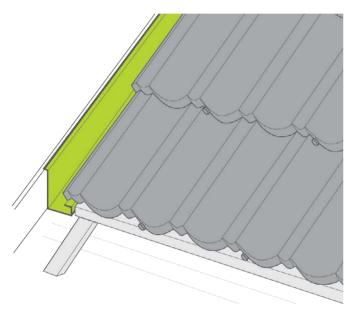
INSTALLING OBLIQUE WALL FLASHINGS WITHOUT BENDING TILES VERSION
